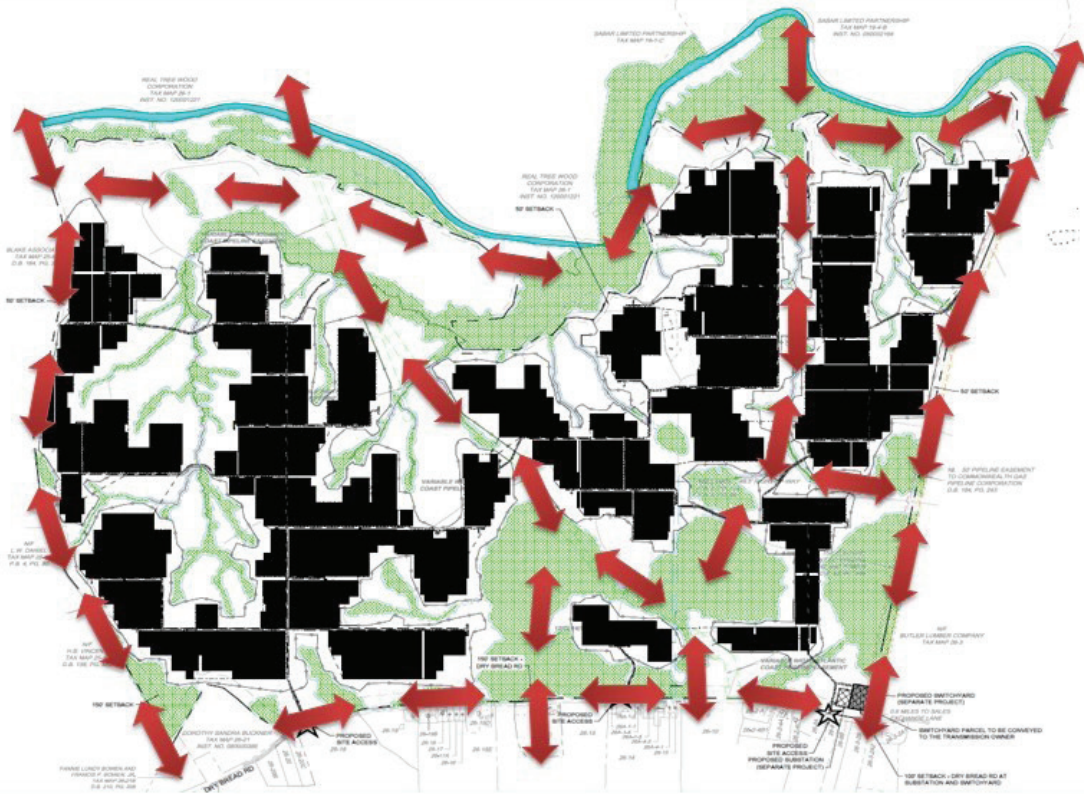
A conceptual site plan for a 1,491-acre utility-scale solar facility showing wildlife corridors throughout the site. Courtesy Dominion Energy.
